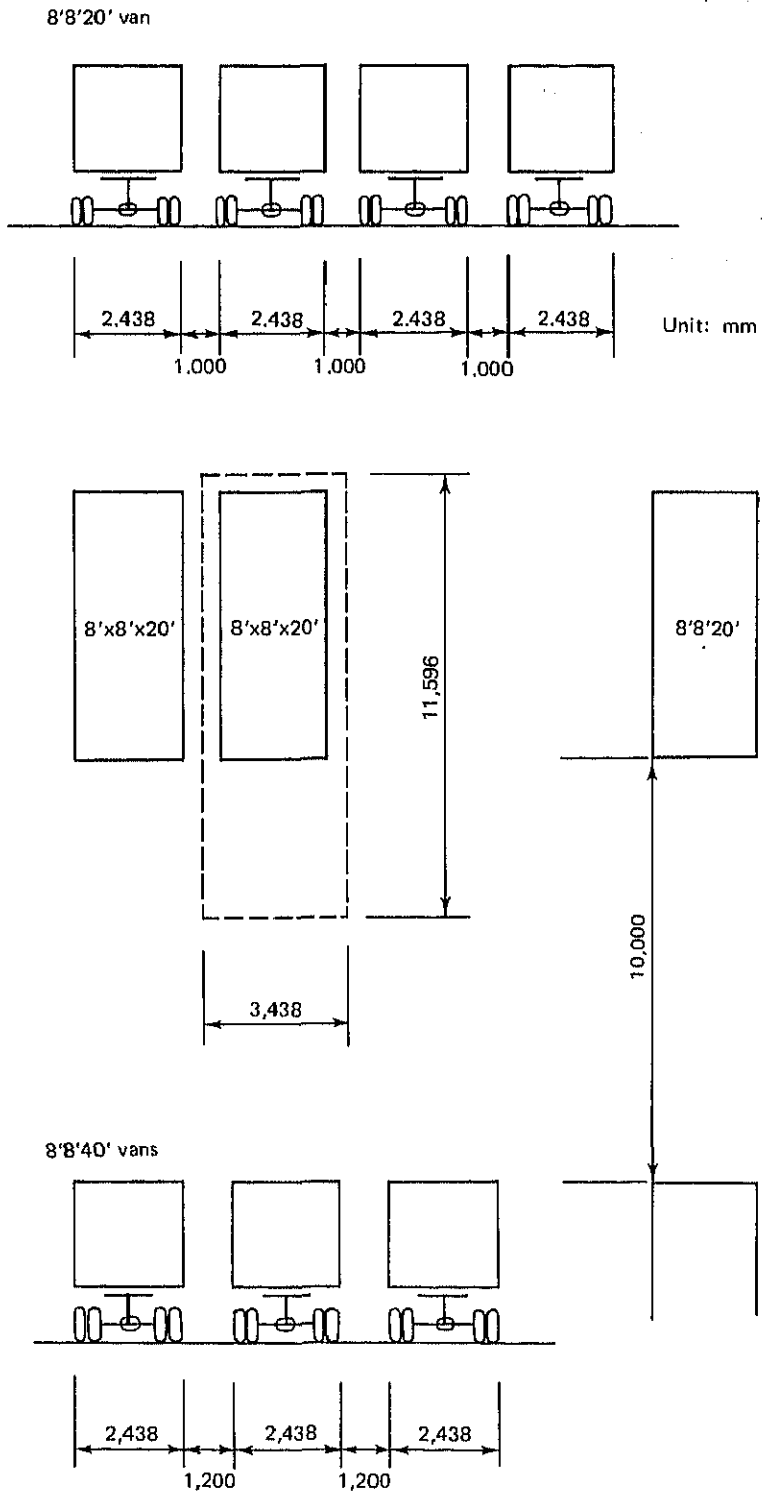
(b) Layout of container yard (Straddle carrier system)
